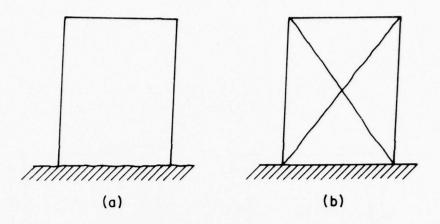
Failure mechanisms for reinforced concrete wall.
